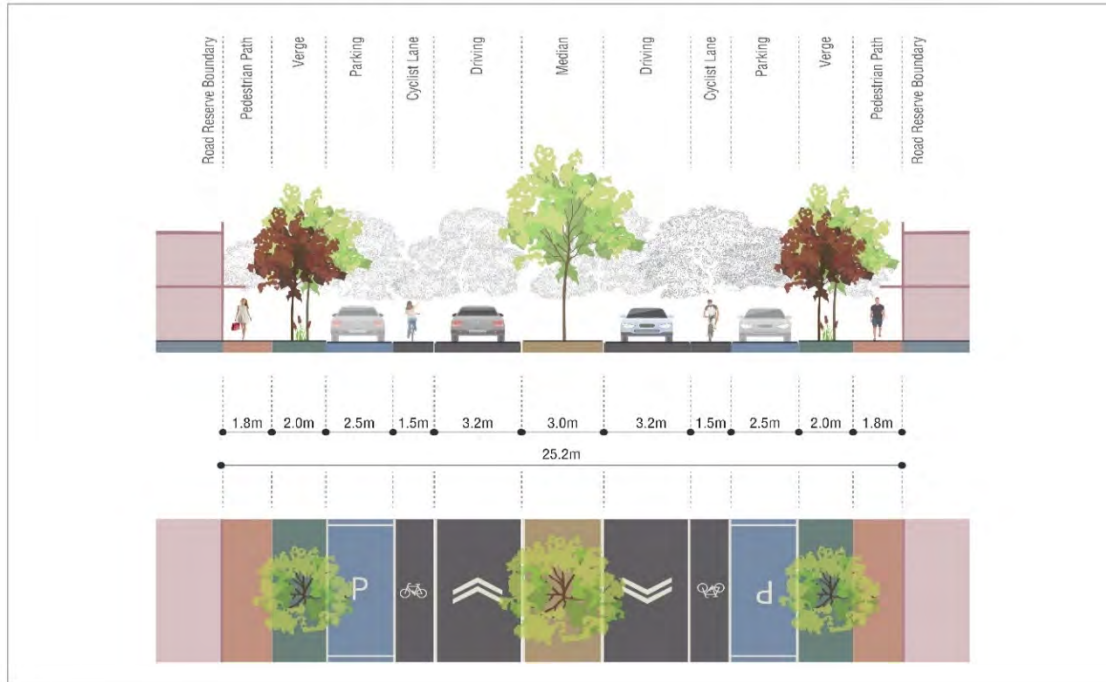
RD03 Maida Vale Road (East of Milner Road), RD04 Maida Vale Road (Milner Road to Raven Street) and RD05 Maida Vale Road (West of Ibis Place)
